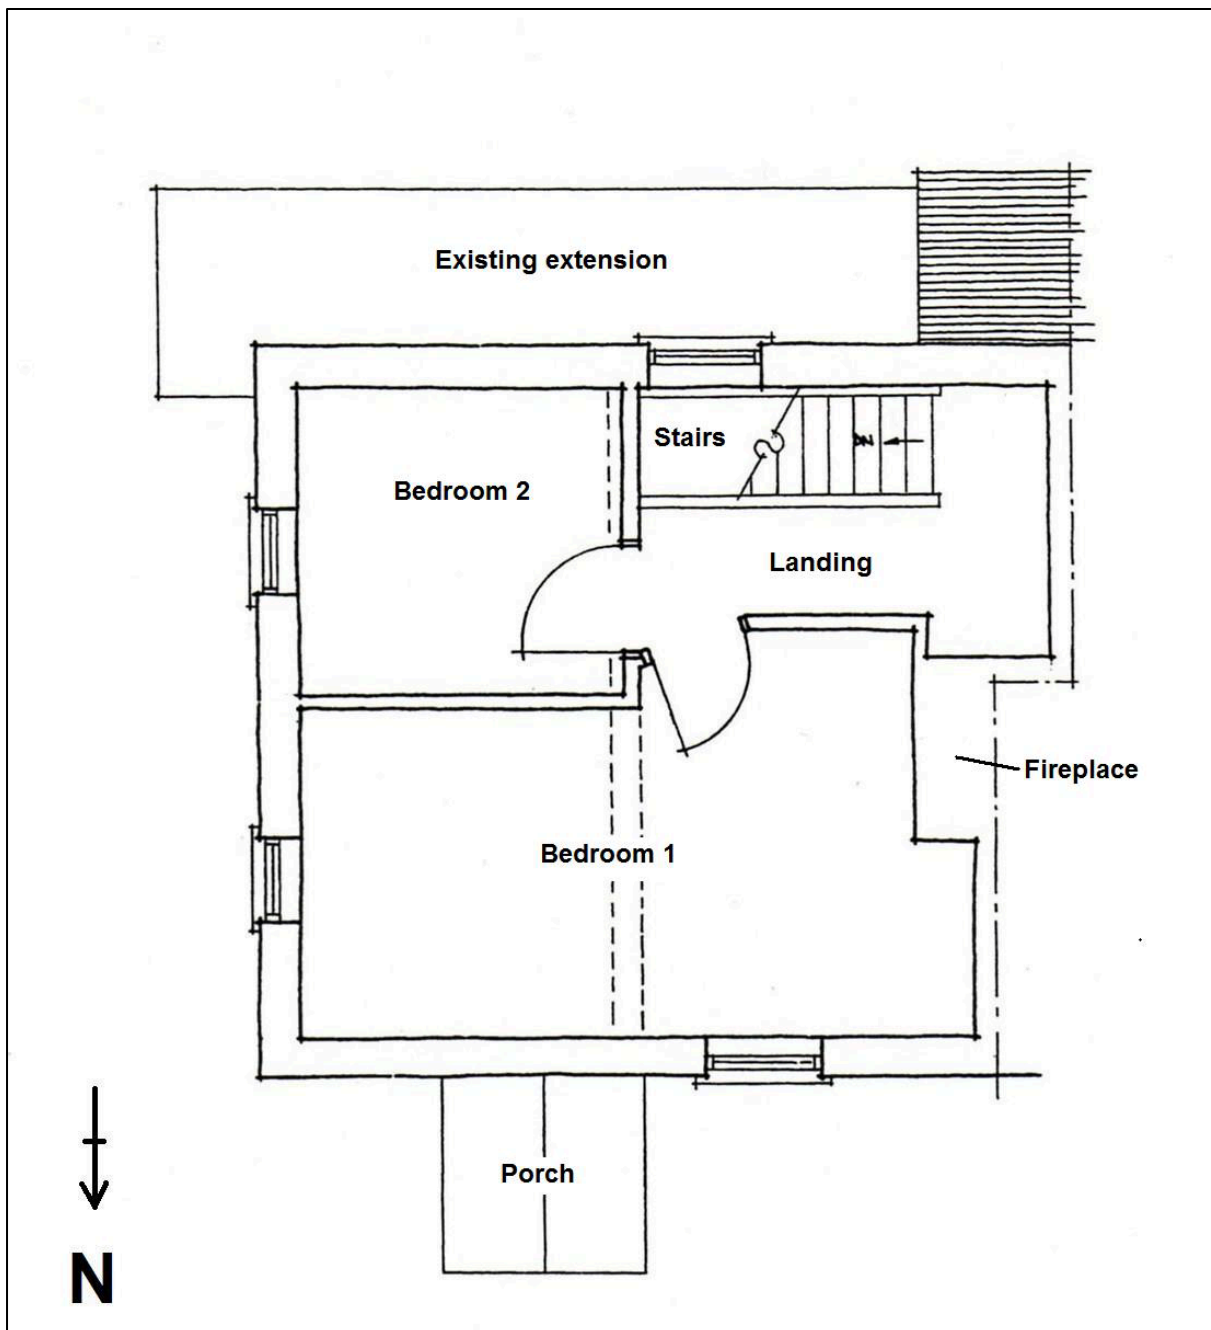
1 Crown Cottages, Cootham: First Floor Plan
